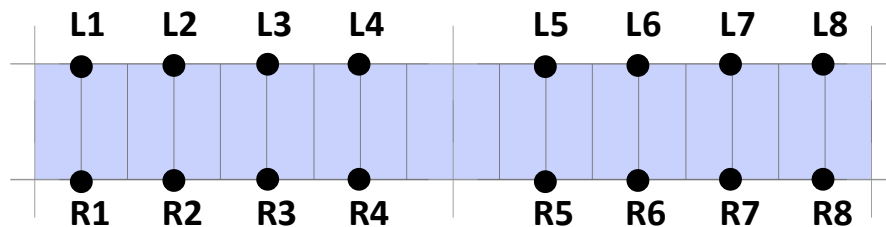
Plan arrangement of reference sensors (channels) in the footbridge structure
